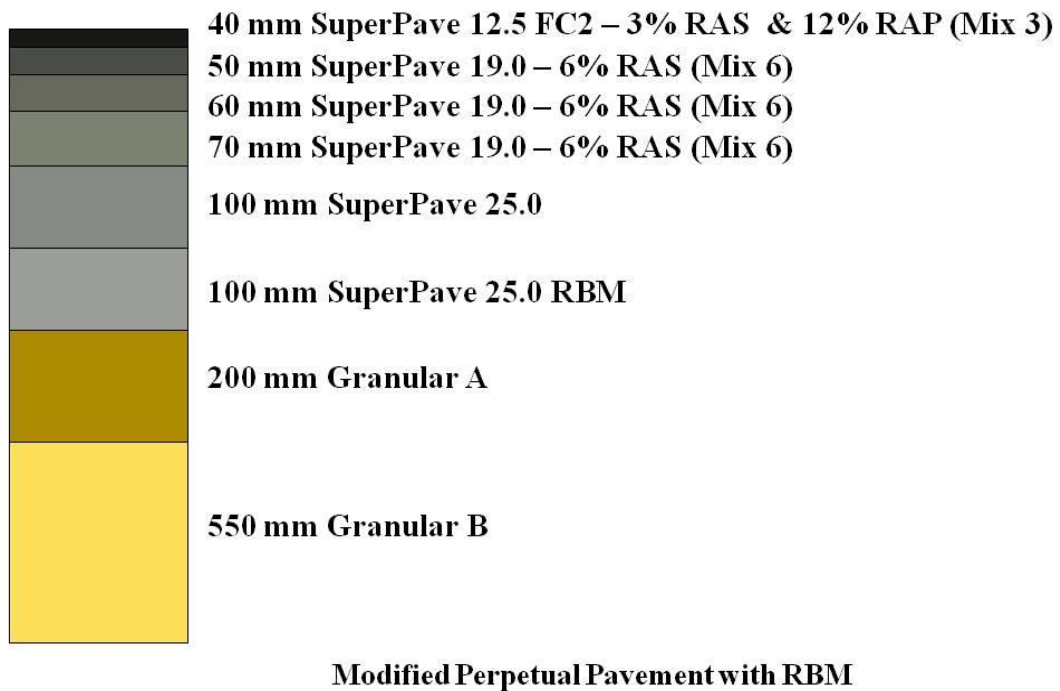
Pavement Two: Perpetual Pavement Section with RAS and RAP
